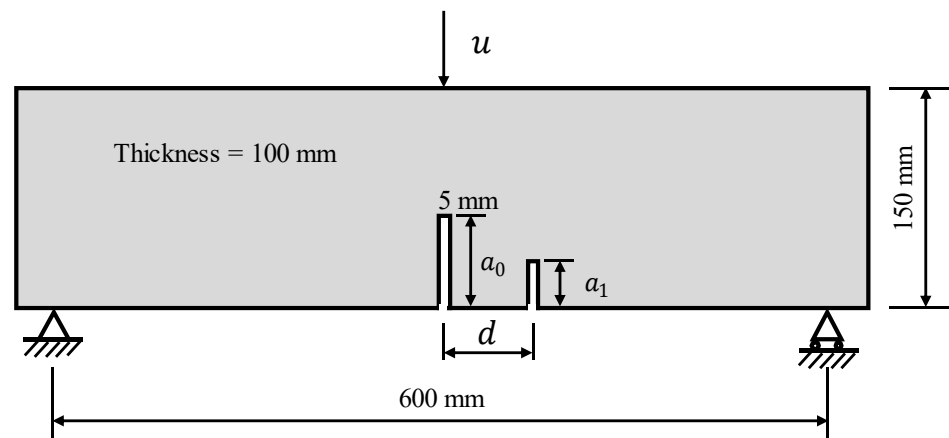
A concrete specimen: geometry, loading and boundary conditions.
